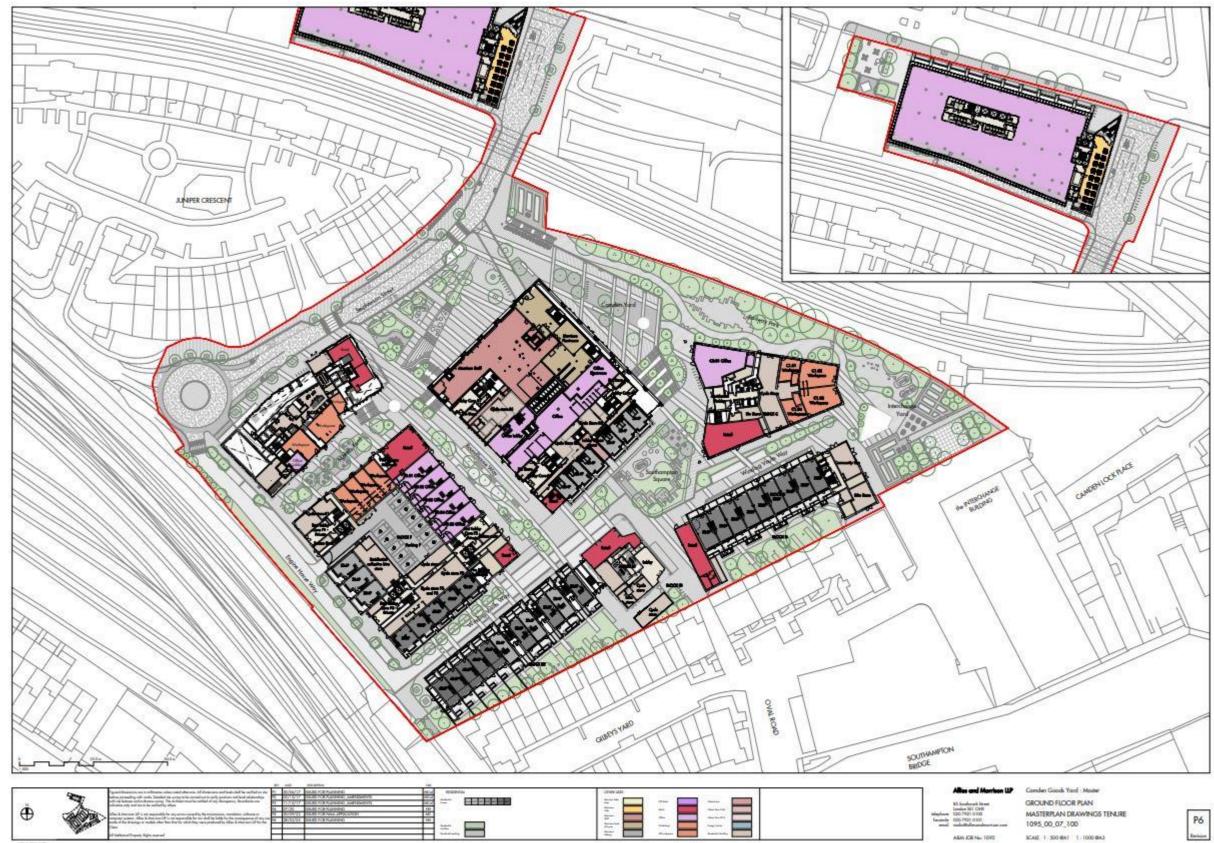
February 2025 Amended Proposed Development MS Parcel Ground Floor Layout
